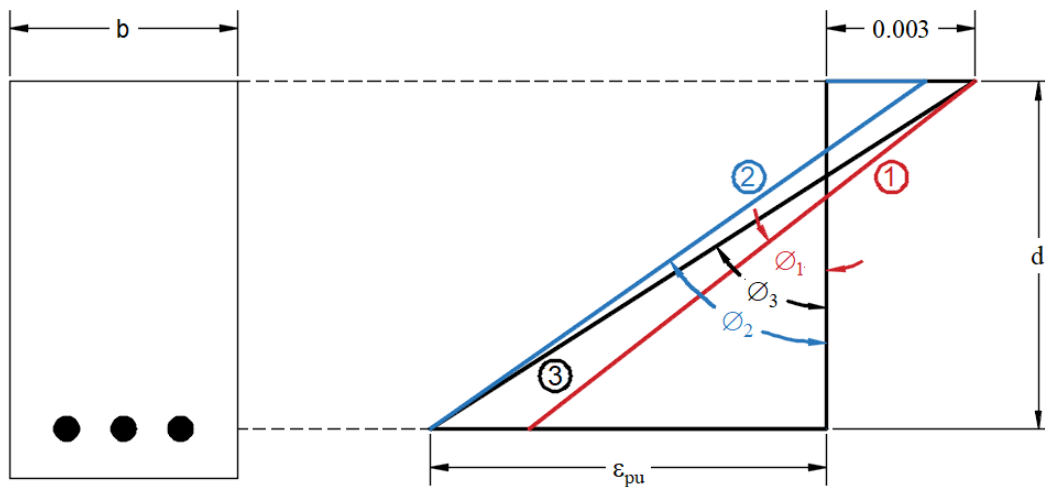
Strain level for reinforced concrete failure modes: (1) Concrete crushing at top, (2) strand rupture, and (3) balanced failure
